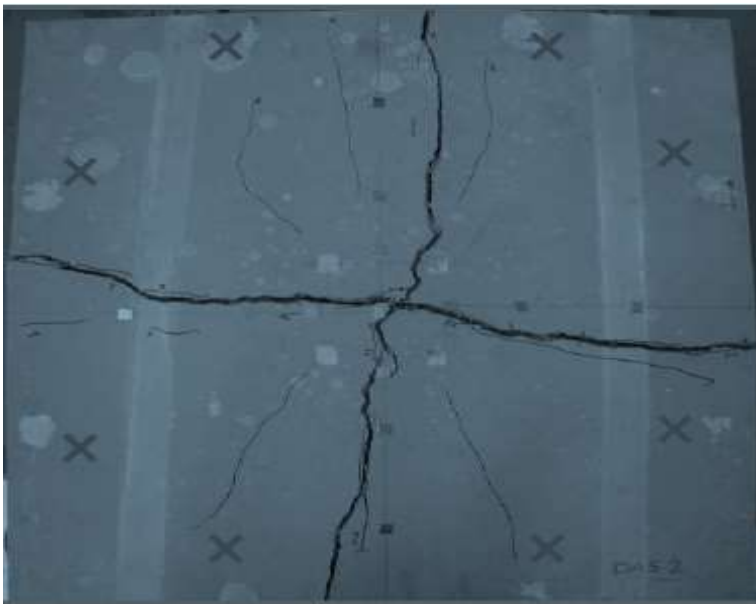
UHPFRC slab failure under central point load (Spasojevic, 2008).
